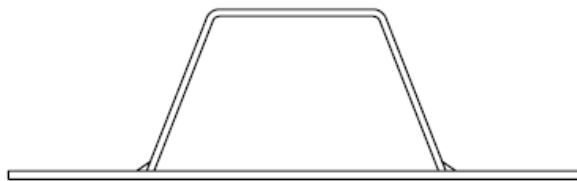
Trapezoidal stiffener welded to a plate.
